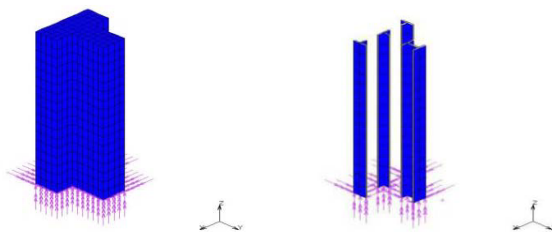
The FEM model of steel reinforced concrete T-shaped column and steel
